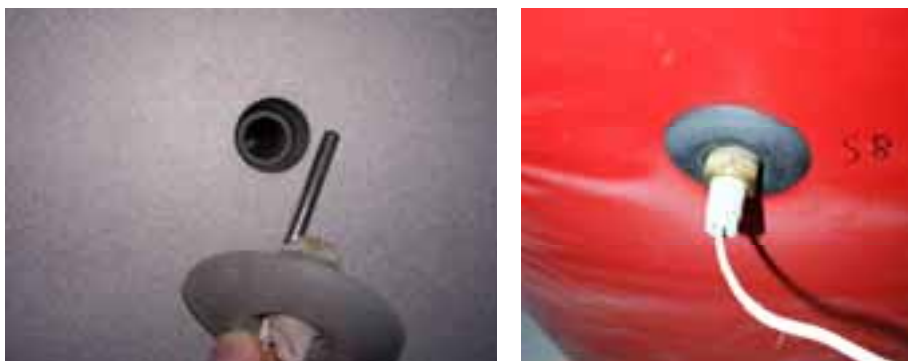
The diameter of the immersion sleeve is too wide and sensor is fixed just with some textile pressed into the immersion sleeve (left), good sensor mounting with fixed sensor and correct dimensions of sensor and immersion sleeve (right)
